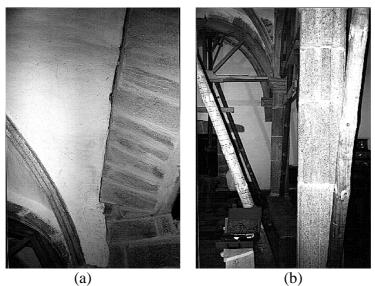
Choir: (a) detail of separation above the main door and (b) columns out of plumb
